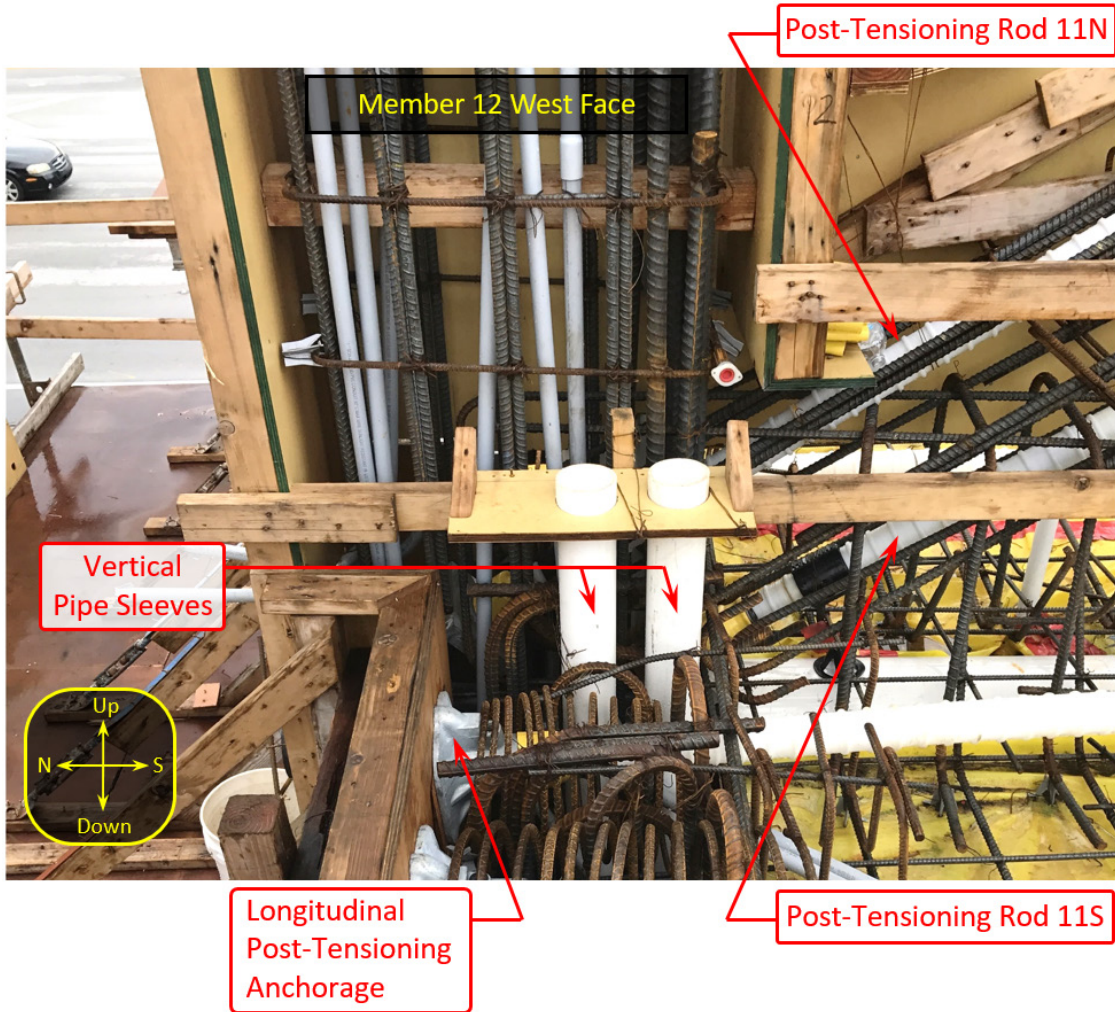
Partially completed installation of conduit and reinforcing bars in the member 11 and 12 nodal region. Corresponds to Bridge Factors Factual Report Photo 8.
